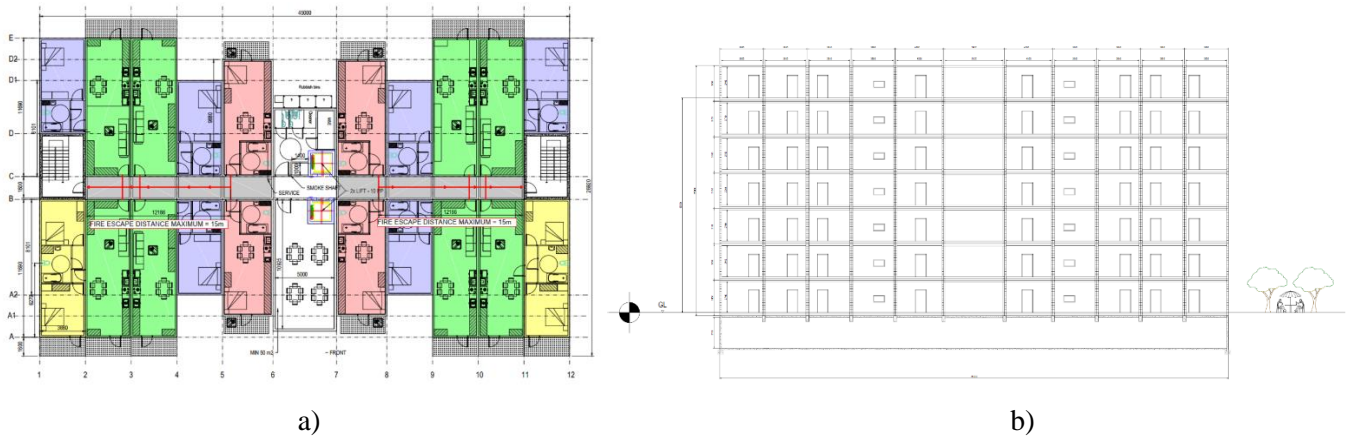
MODCONS Modular building design comprising 7 storeys, a) typical floor plan and b) elevation
